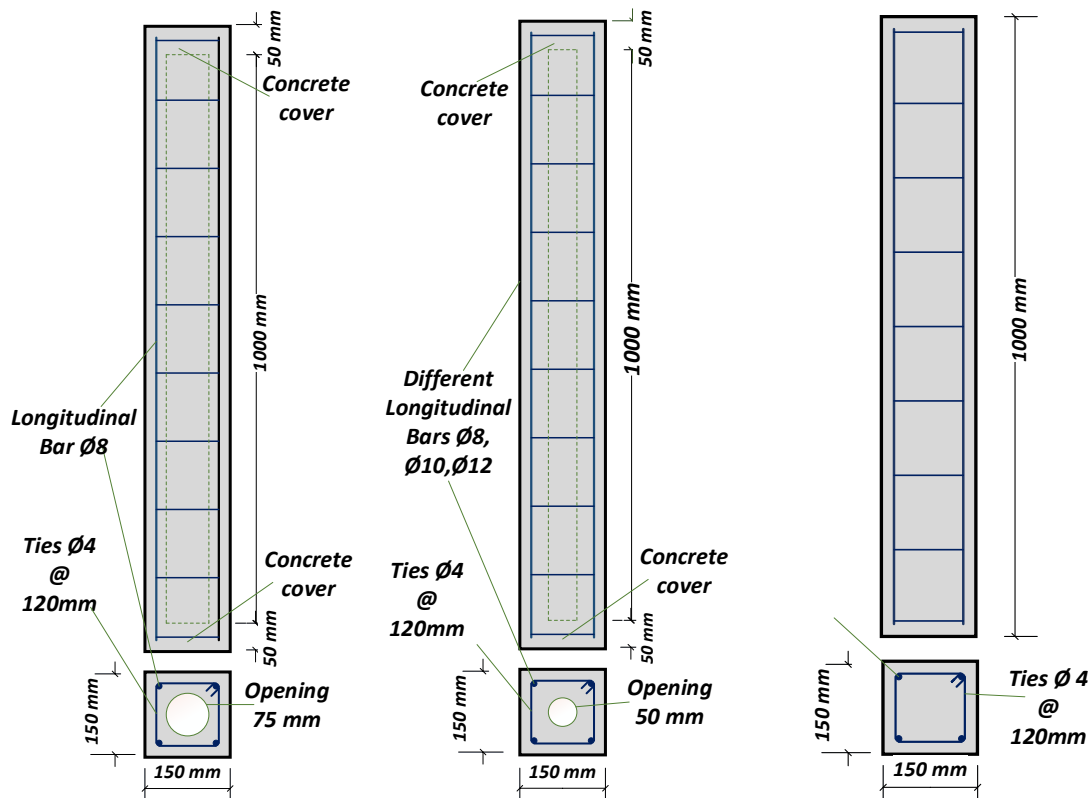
Column elevation and cross-section for Solid and Hollow Columns.
